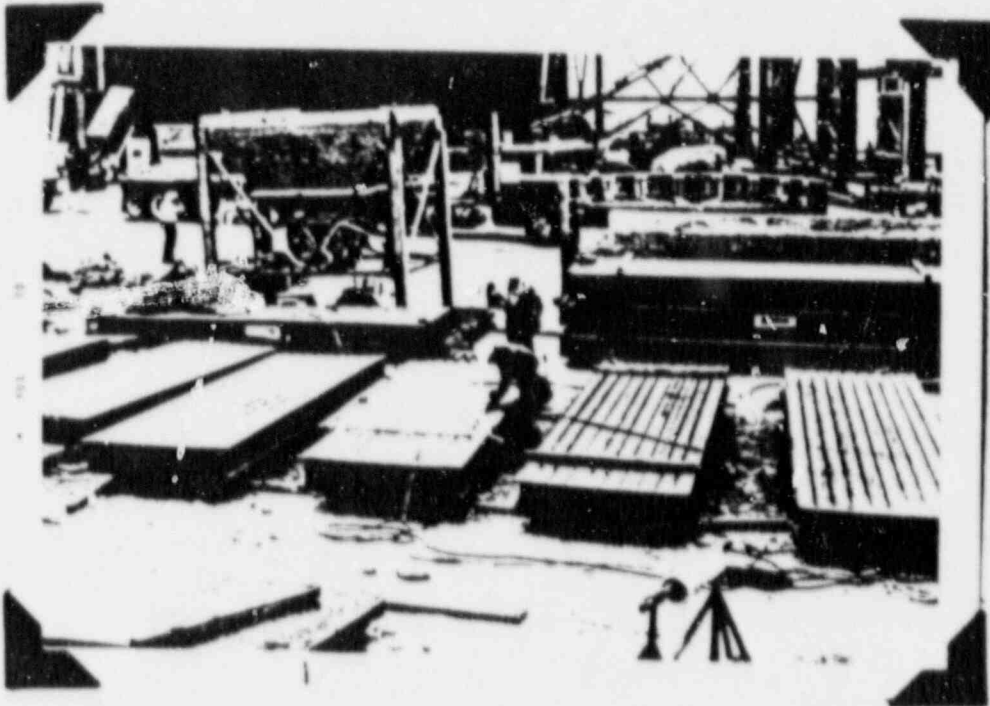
Wide Flange Beams to be Installed in the Base Section of the vertical walls of the Containment Building.
